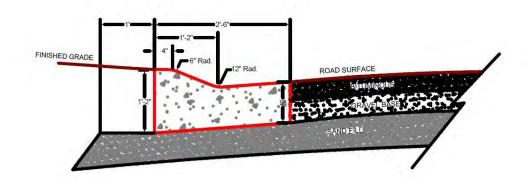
A.1. MINIMUM PARKING AREA CURB SPECIFICATIONS
